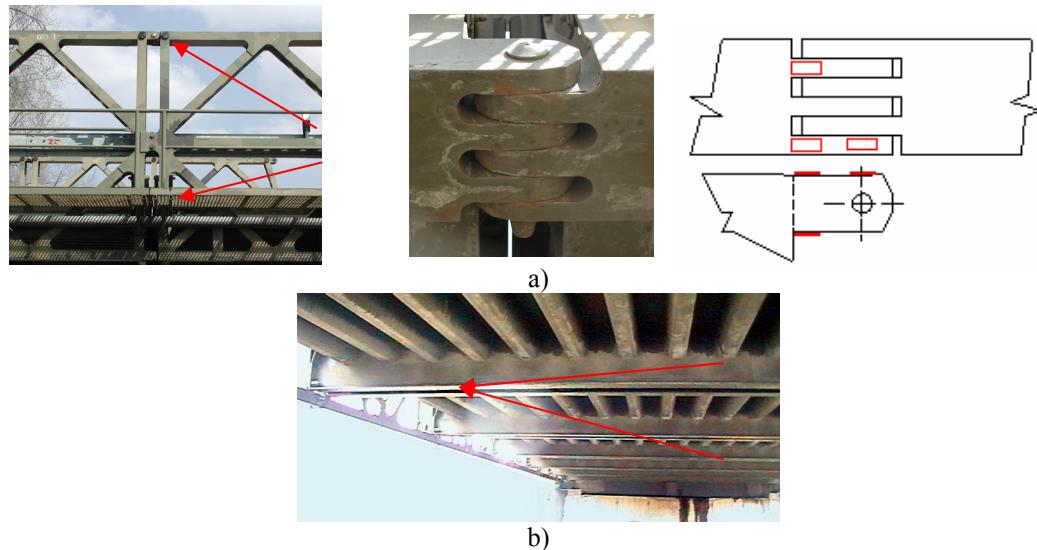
Strain gauge displacement: a) pin connectors, b) crossbeams center, lower flange
